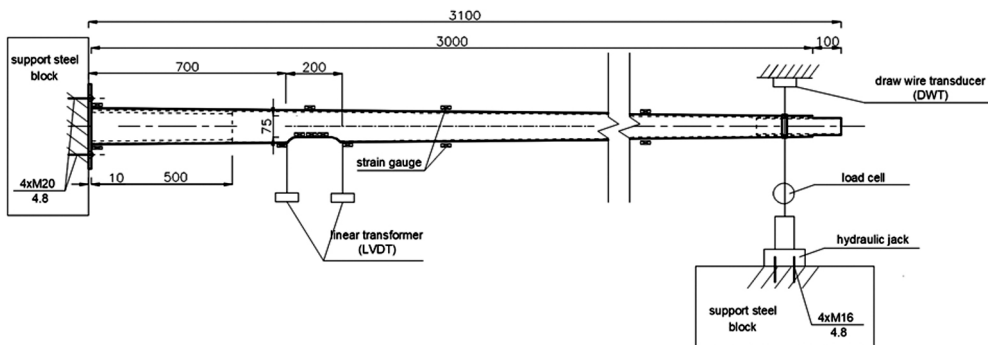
Schematic drawing of the full-scale test setup for 3.0 m poles
